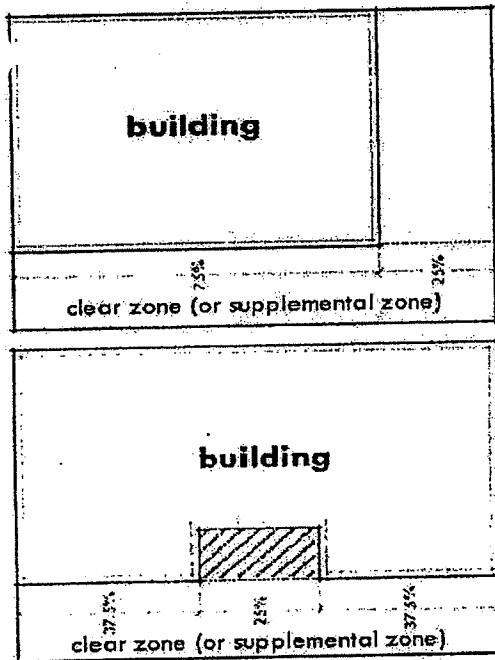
Examples of permitted building placement along core transit corridors. Parking is not permitted in the hatched area between the street-facing facade and the sidewalk.
